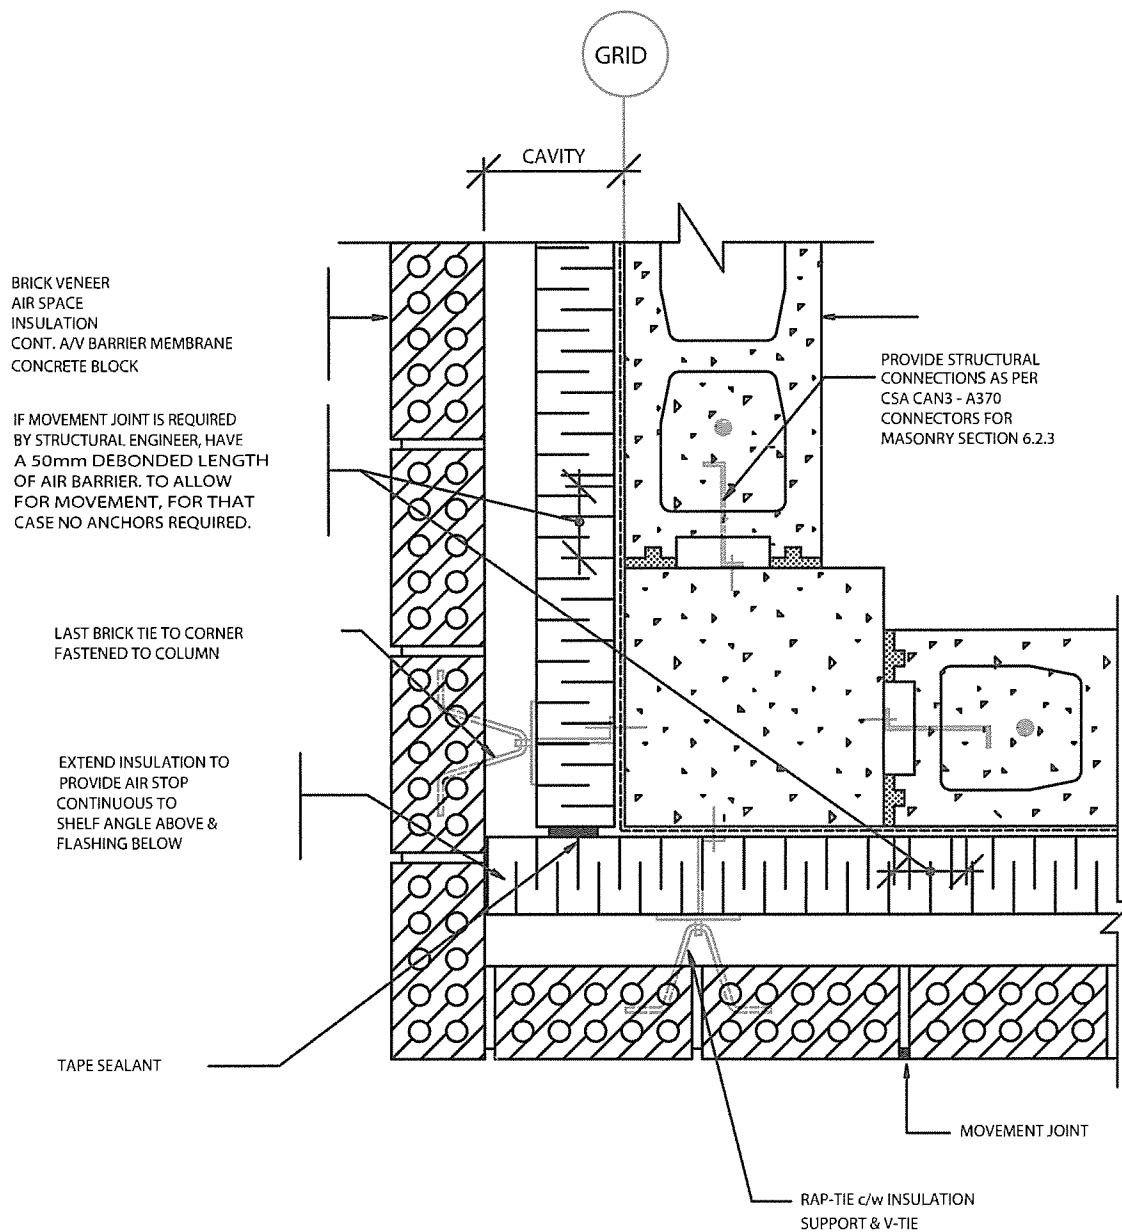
BRICK VENEER/CONCRETE BLOCK - CONTROL JOINT/AIR STOP
